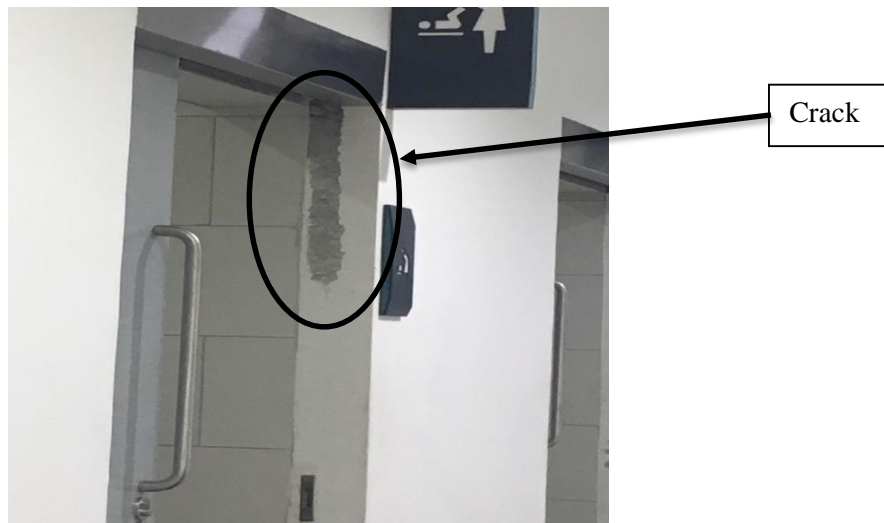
Wall Crack Defect at Fahrenheit Shopping Mall, Kuala Lumpur
